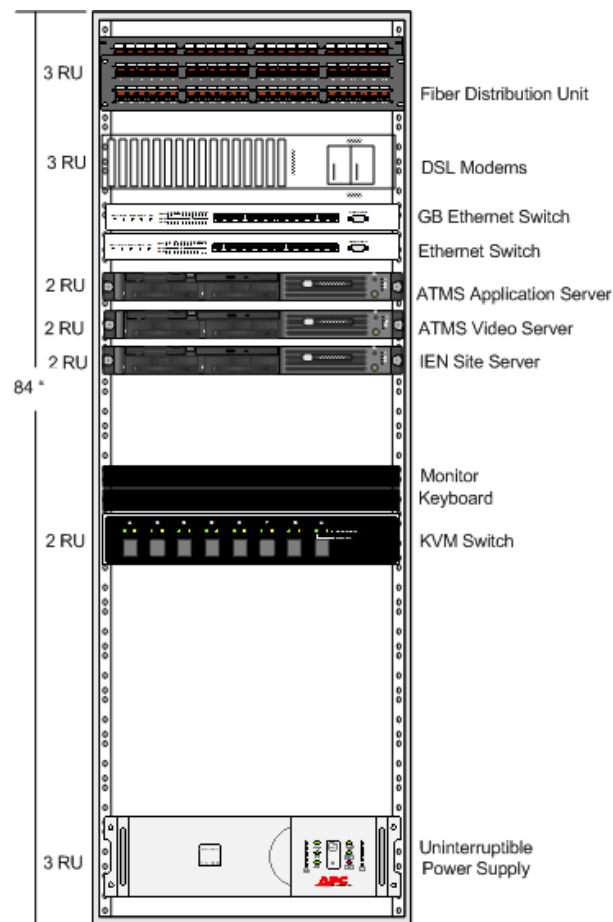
South Gate Primary LCC Equipment Rack Elevation
